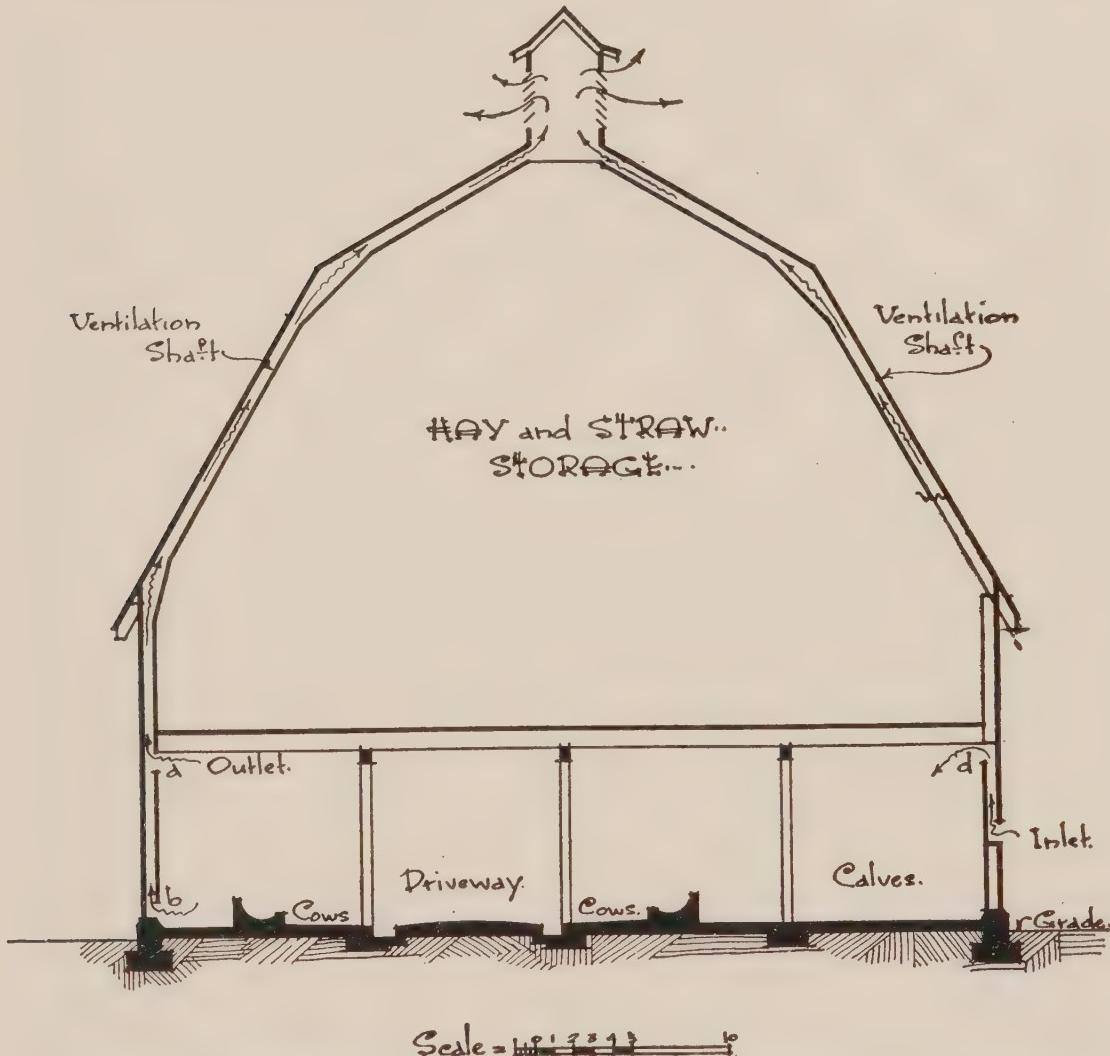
Elevation Woodland Dairy Farm barn. Note system of ventilation. a, outlet in summer; b, outlet in winter; and d, inlet at all times. Also the dirt-tight floor over the stock. Straw for bedding as well as hay for feed is stored in the loft.
